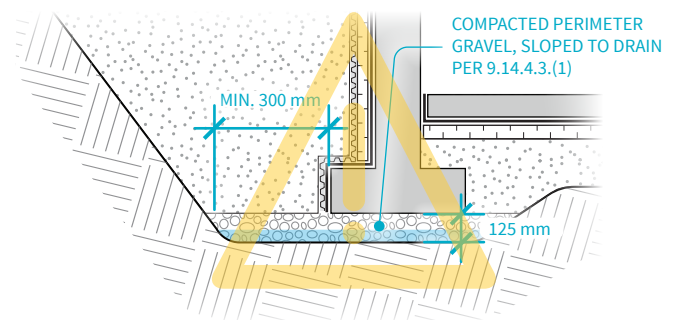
Example of BC Building Code gravel option (9.14.4.) for foundation drainage system; not recommended for best practice (does not allow for maintenance).
